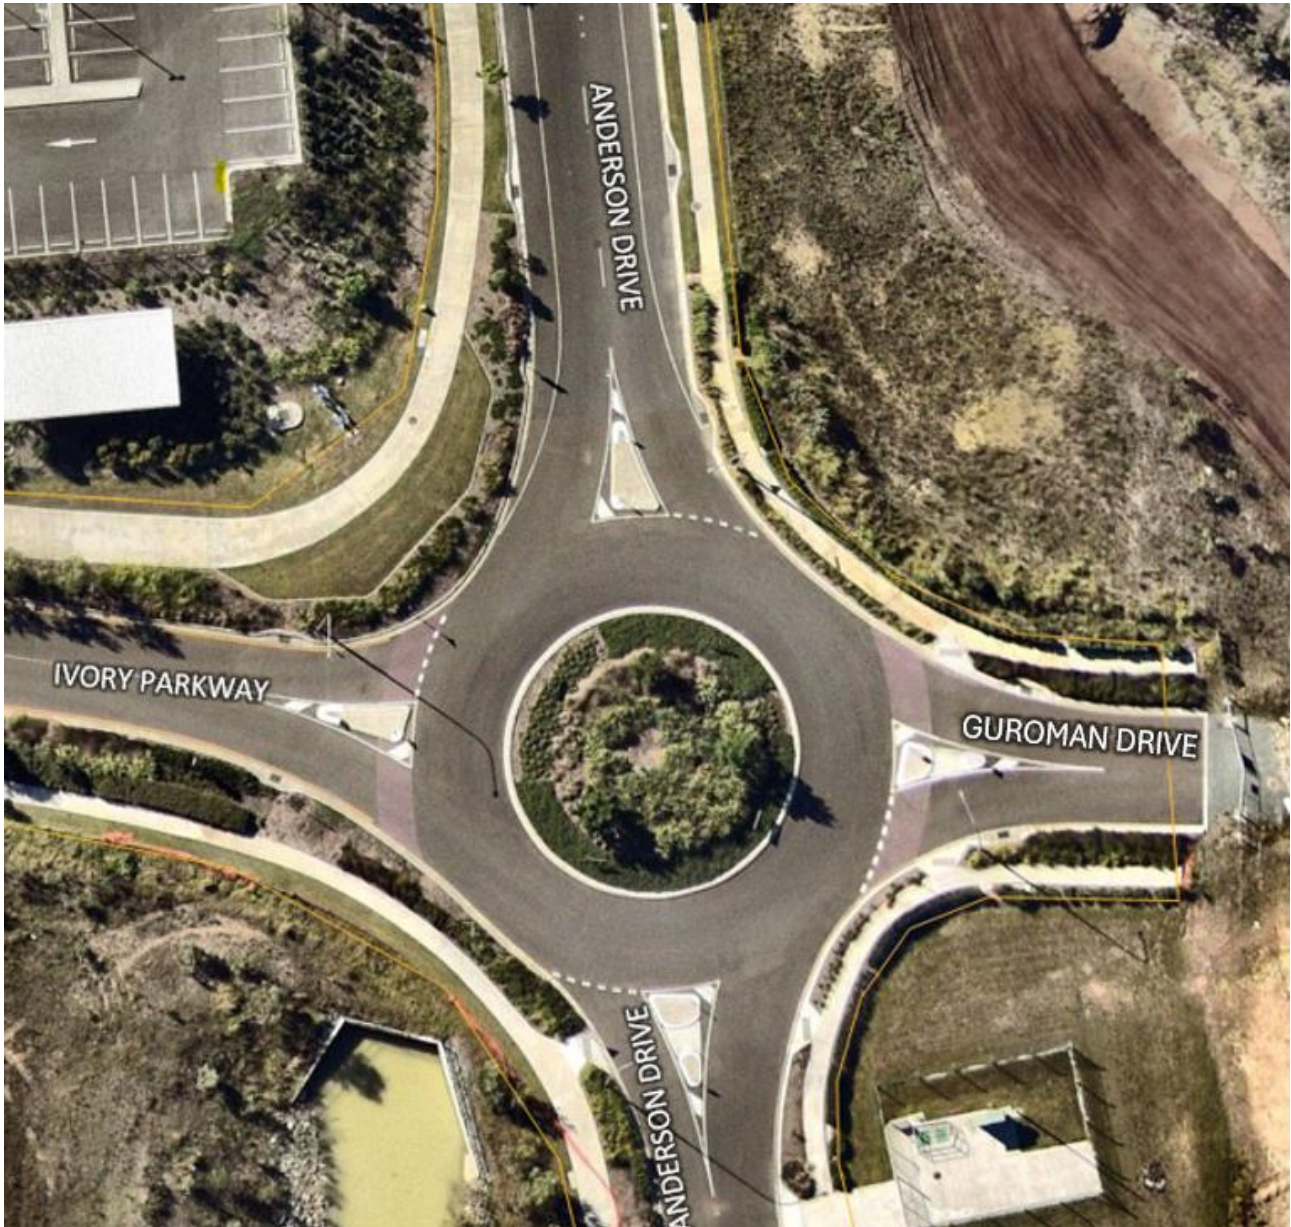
Anderson Drive / Road 103 / Road 53 roundabout layout (Source: Nearthmap)
